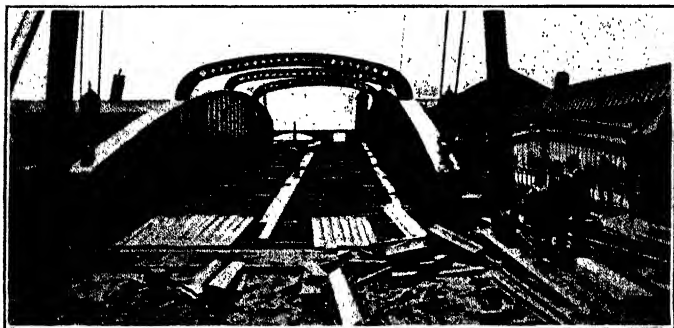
Hog backed plate girder through bridge with decking removed.
